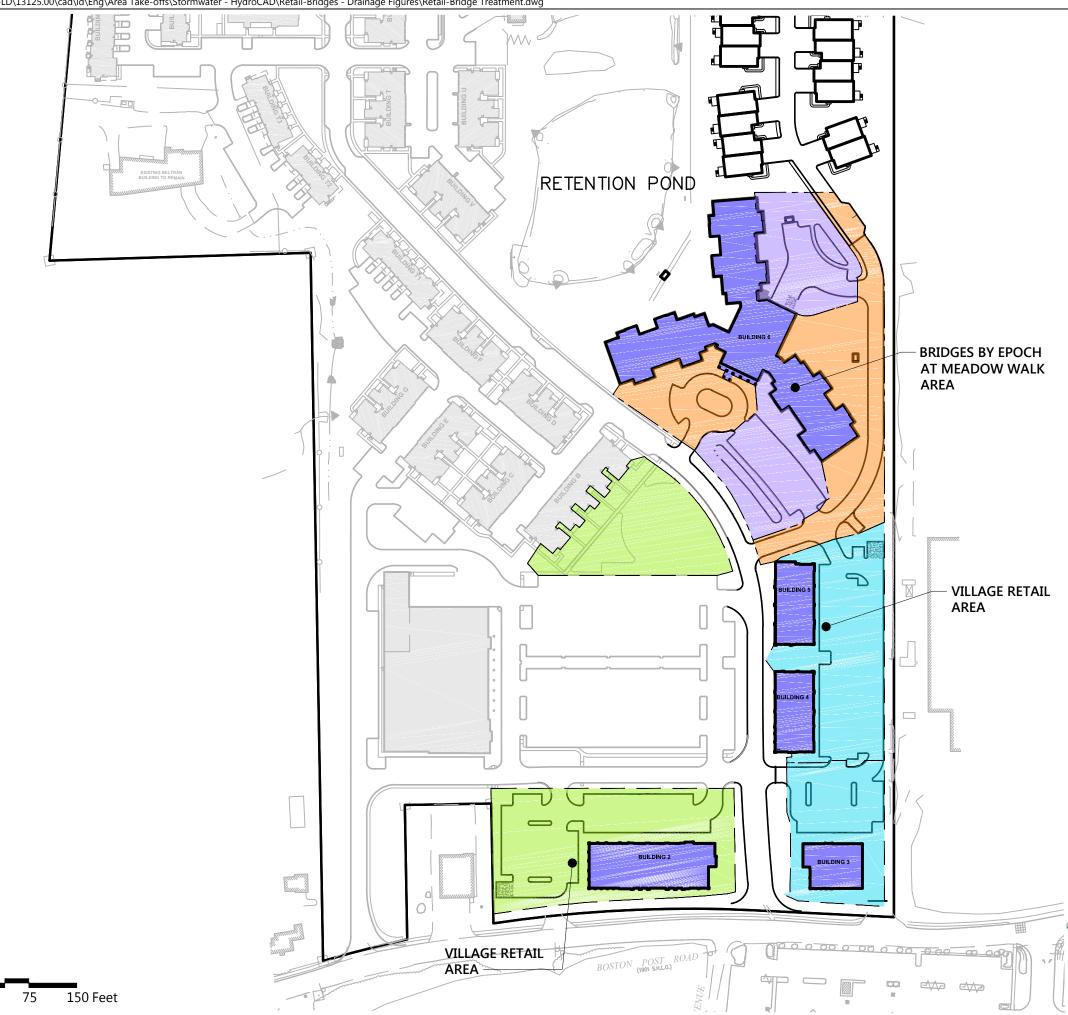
Master Plan Proposed Drainage Conditions Village Retail & Bridges by Epoch at October 2016 Meadow Walk Sudbury, MA
